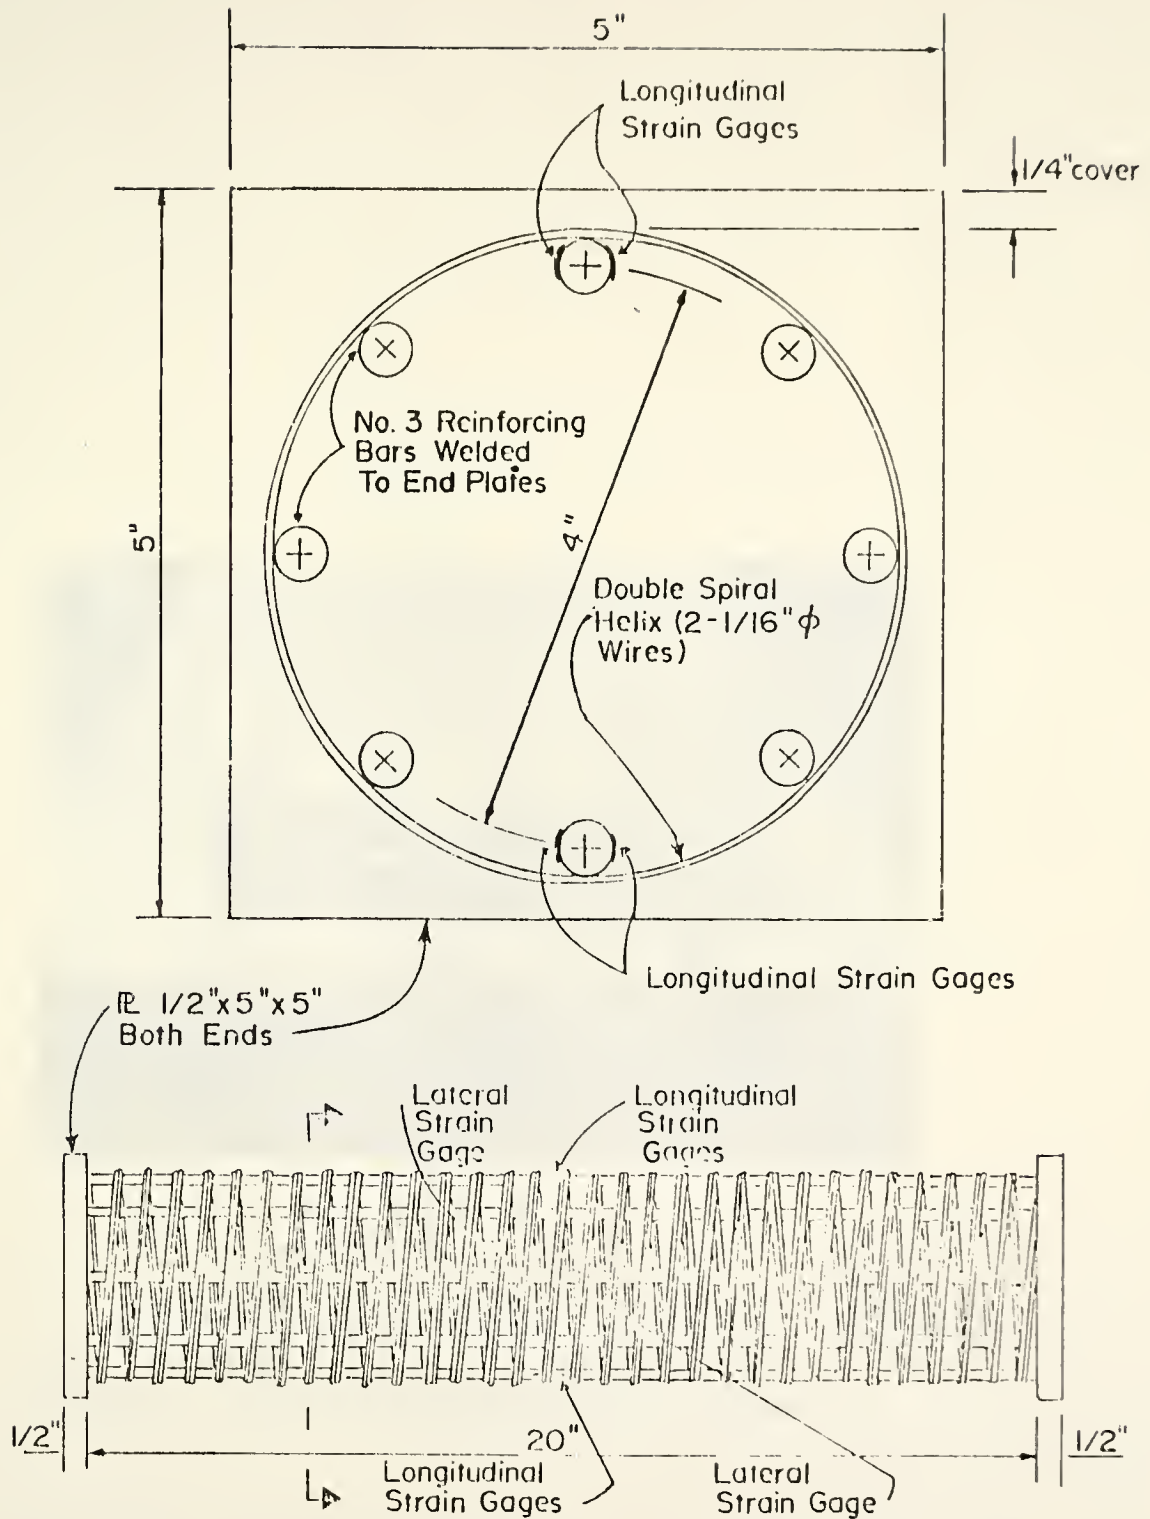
SPIRAL SPECIMEN REINFORCEMENT ARRANGEMENT
